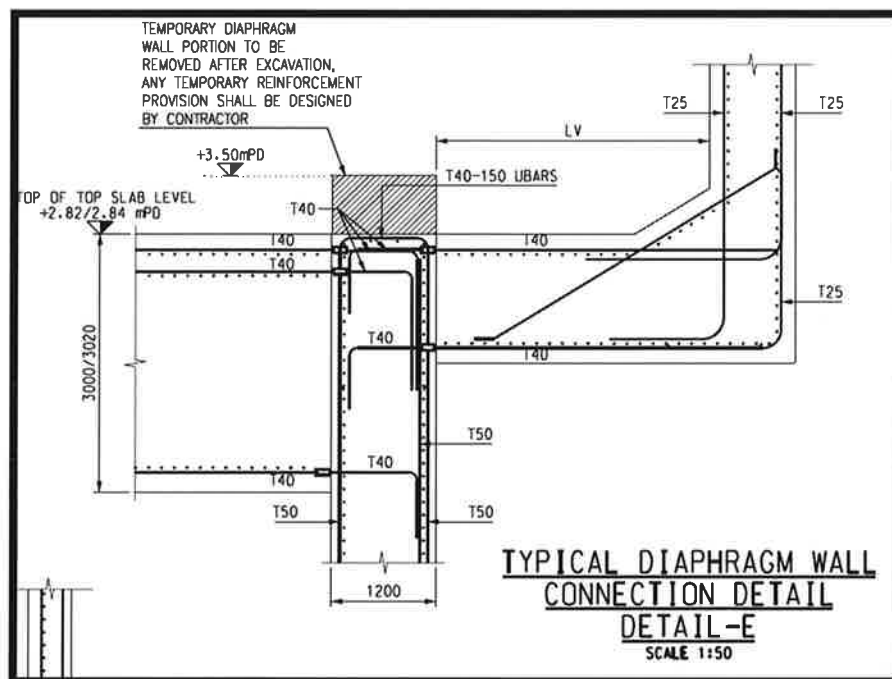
Detail-E in working drawing no. 1112/W/HUH/ATK/C12/606 (Rev. A)
